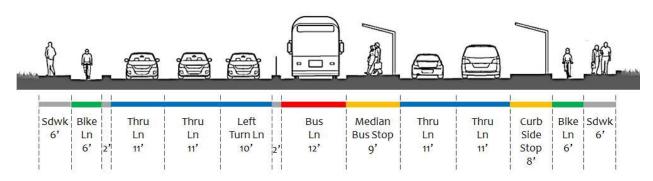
Cross Section of Shoreline Boulevard at Terra Bella Avenue (Looking South)
